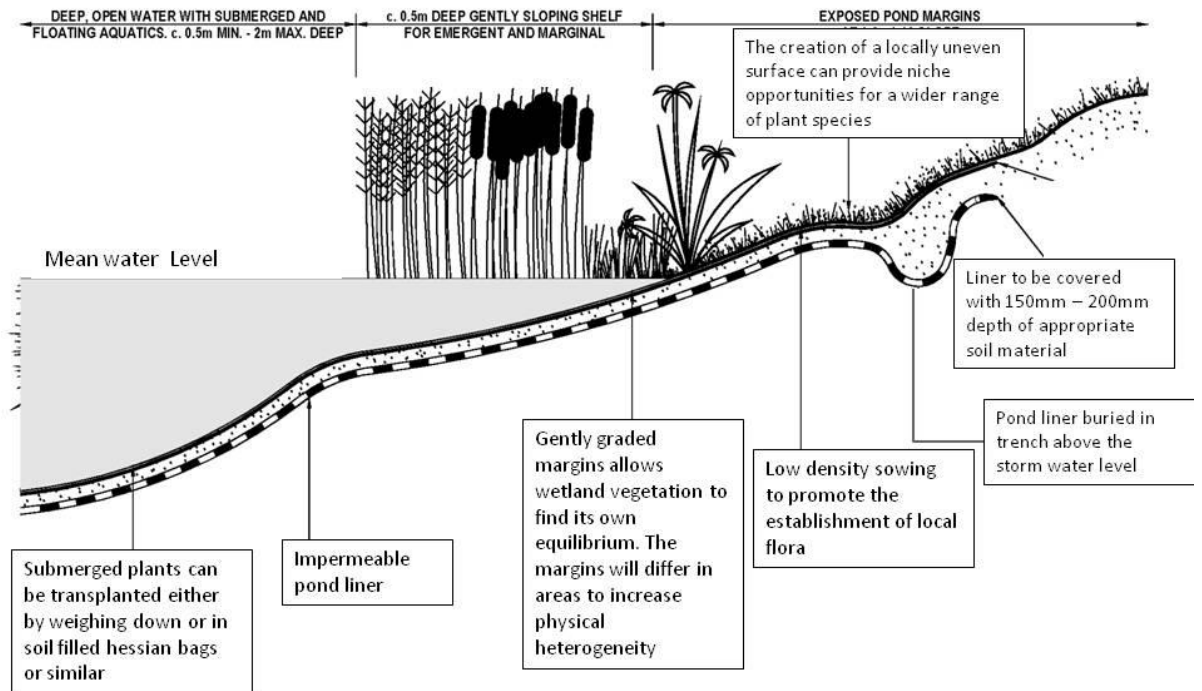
Section through margin of SuDS Pond. Adapted from Vol. 4 UK DMRB
